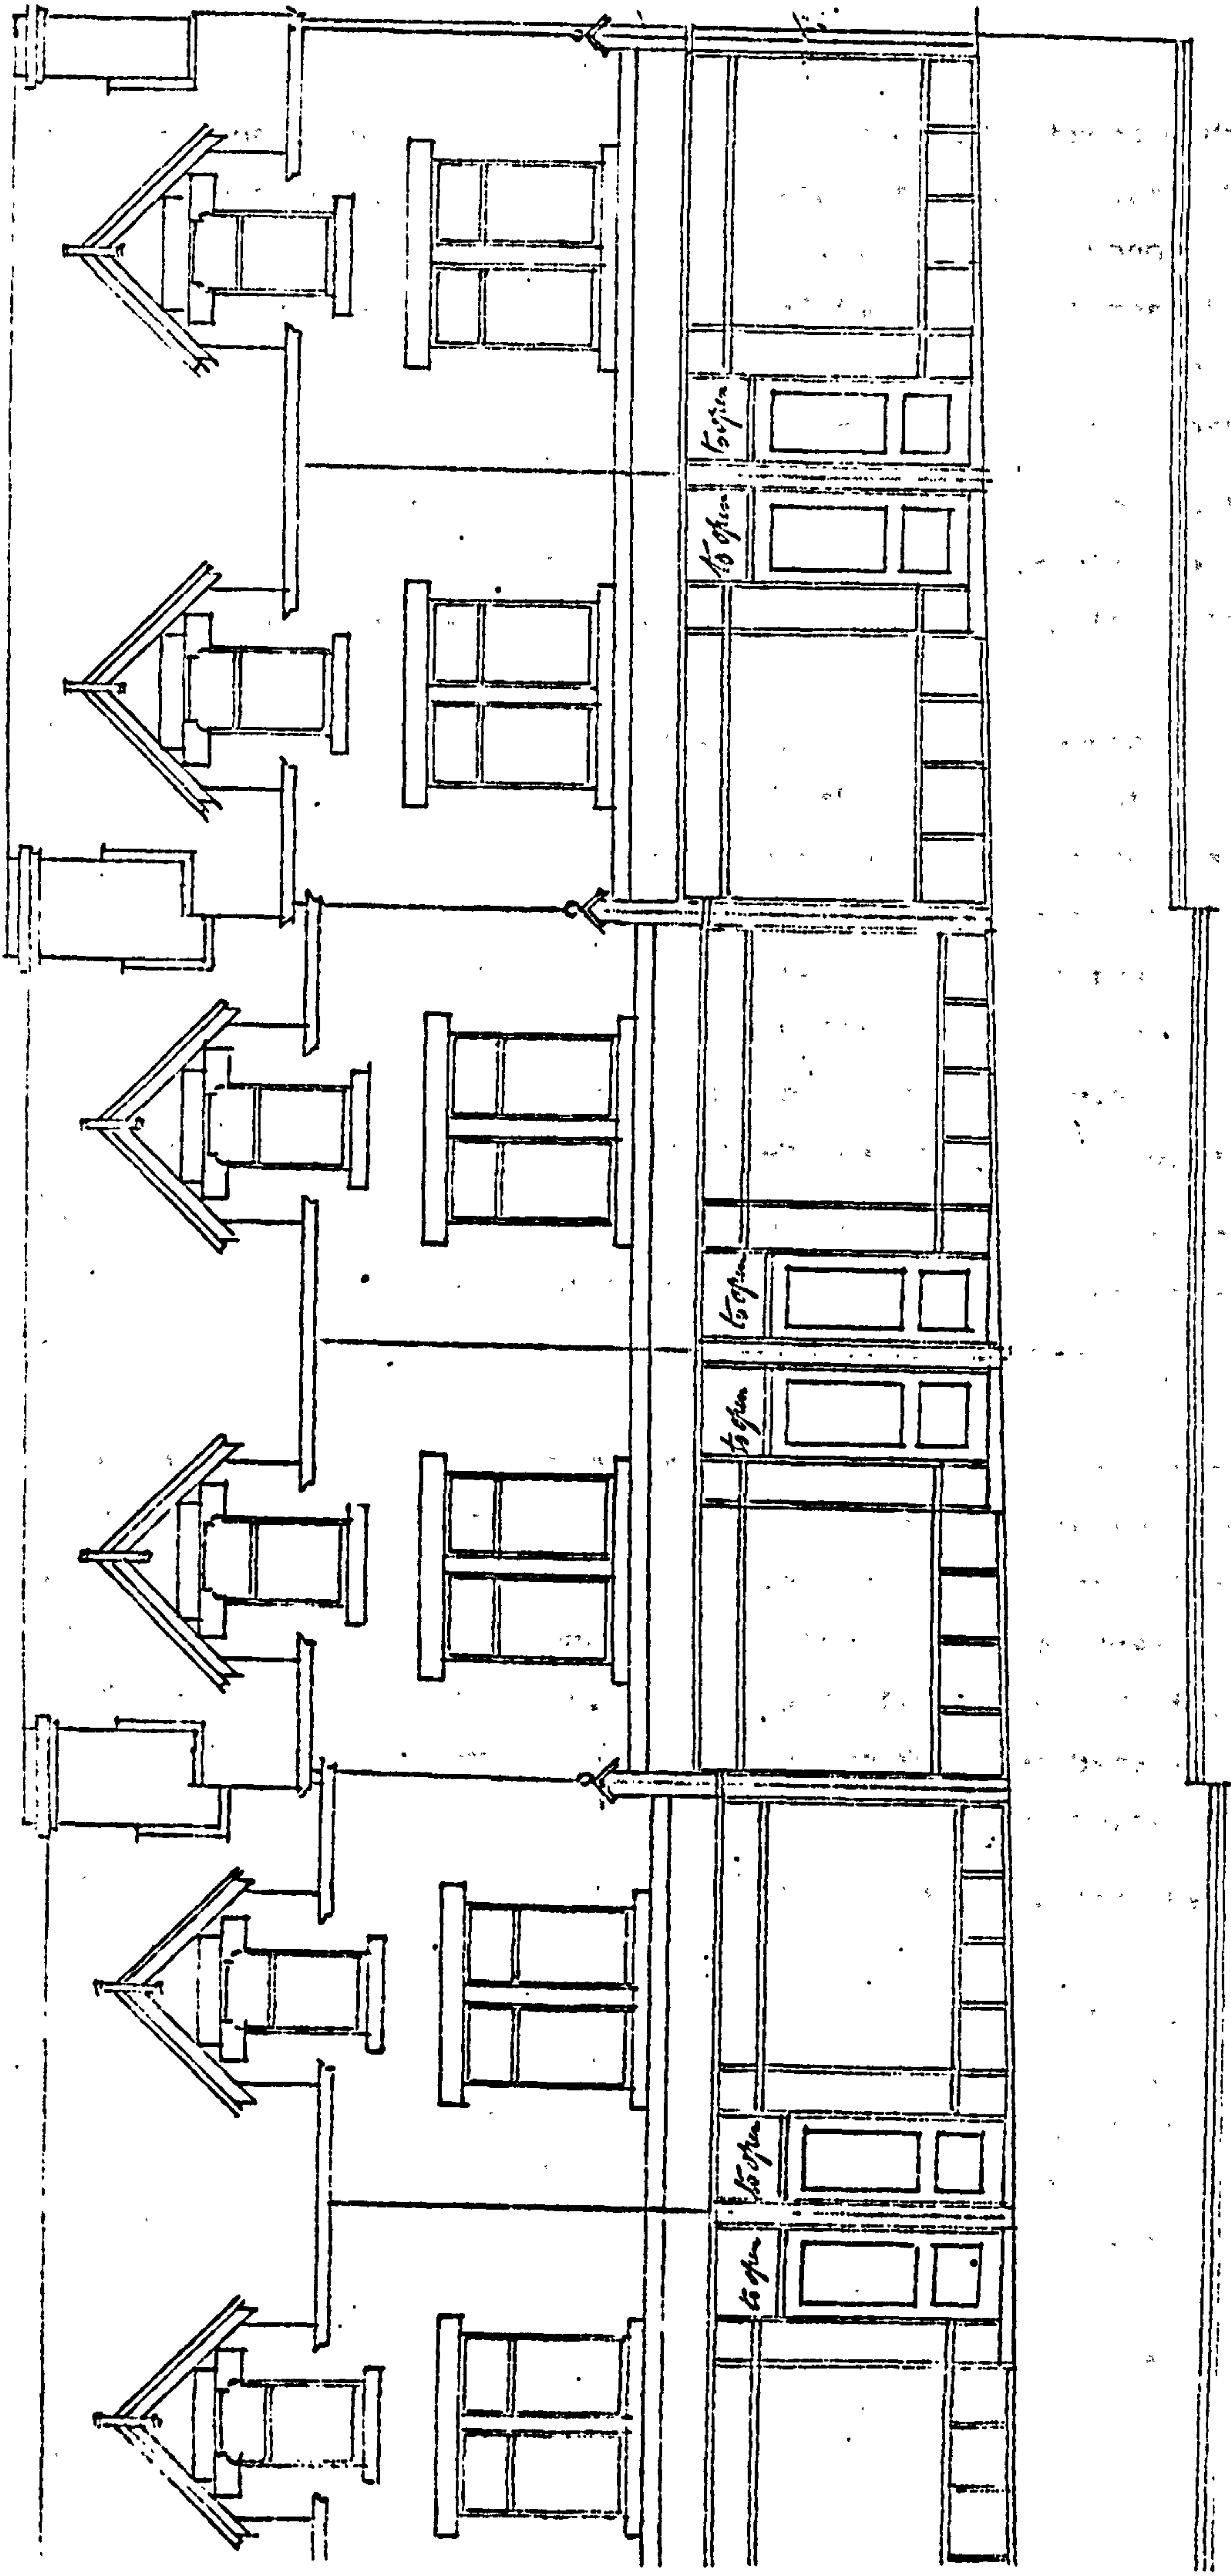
Deposited elevation of houses and shops, Brudenell Road (D. Dodgson 1900).
